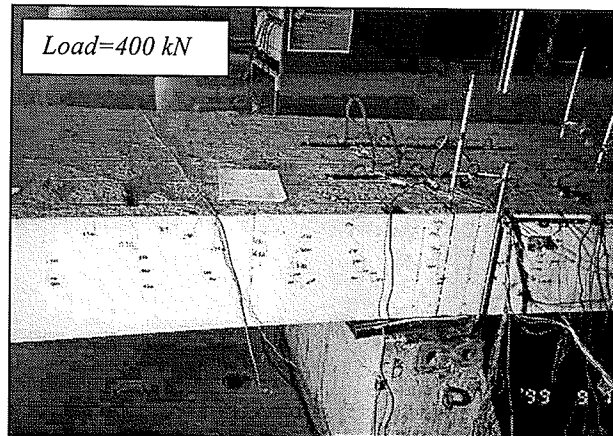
Typical crack pattern at 400 kN for the strengthened cantilevers
